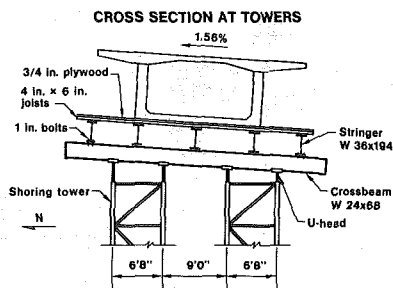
Cross Section of Top Portion of Falsework System at Shoring Tower Location
